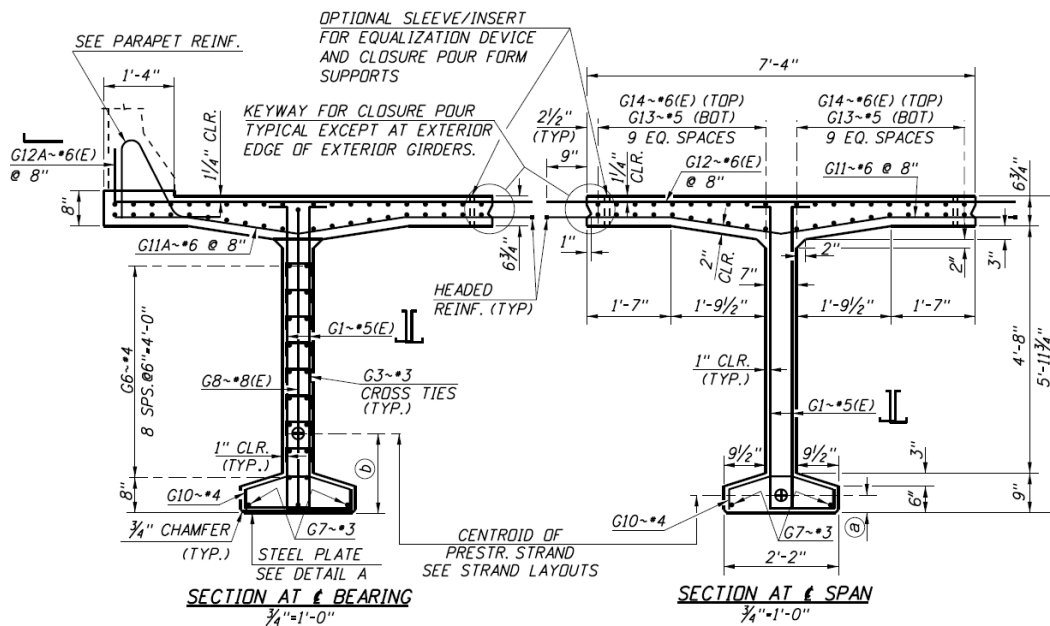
Girder section views of the SH-36 Bridge over Bear River (NTS).
